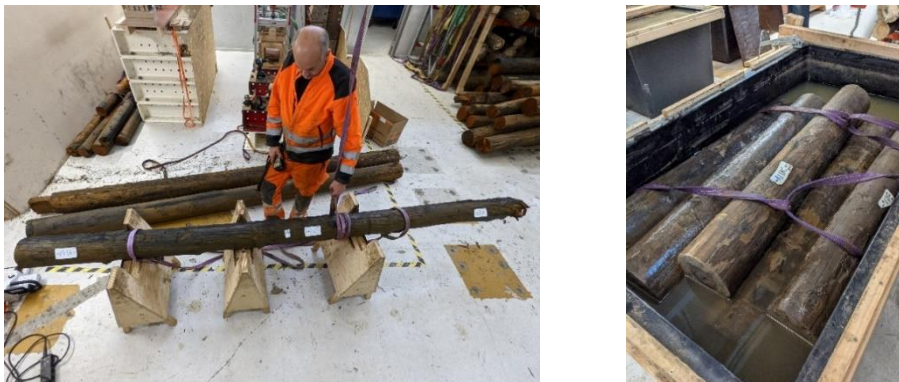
Pre-cut 4m pile segments and cut foundation piles submerged in water.
